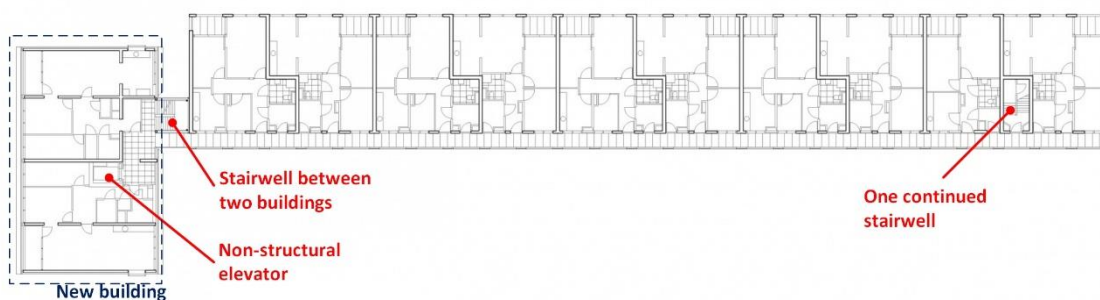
Floorplan of top-up and new constructed building (Hans van Heeswijk architecten, 2003; Adapted by author).
